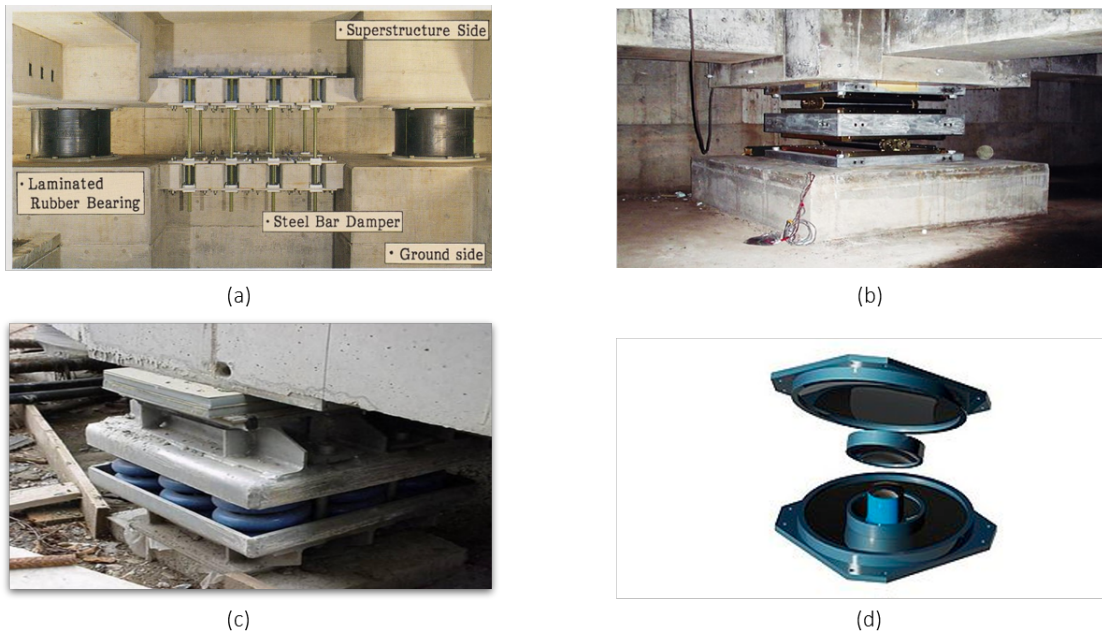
Elastomeric rubber bearings (a) [7], Roller and ball bearings (b) [44], steel spring bearings (c) [8], friction pendulum bearings (d) [43].
